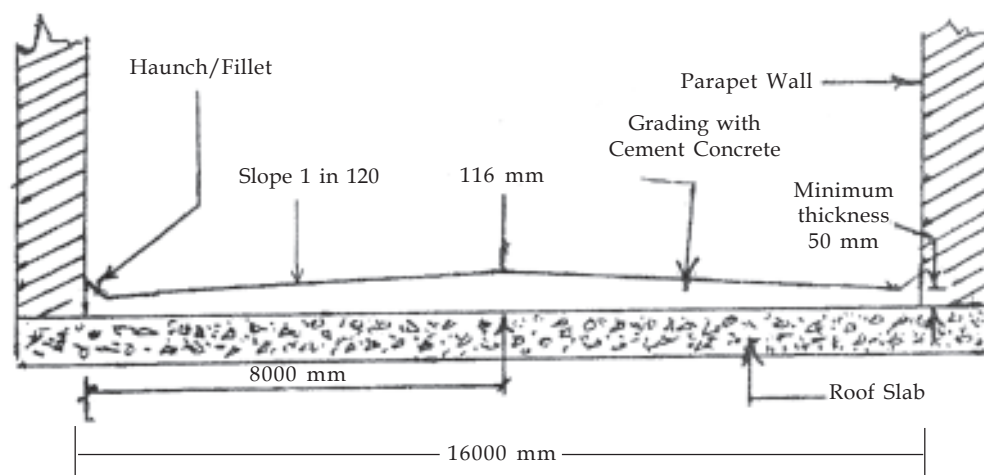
Grading Roof Slab with Cement Concrete with details of thickness to be provided for specified gradient, position of Haunches/Fillets
